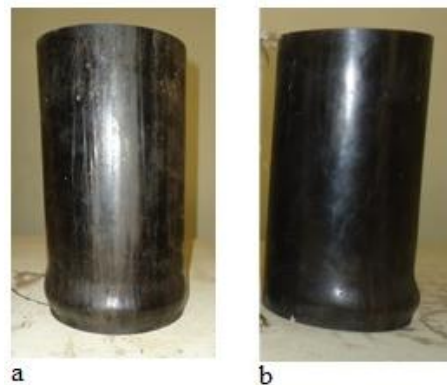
Failure of bare steel tubes under (a) Axial loading (b) Eccentric loading
